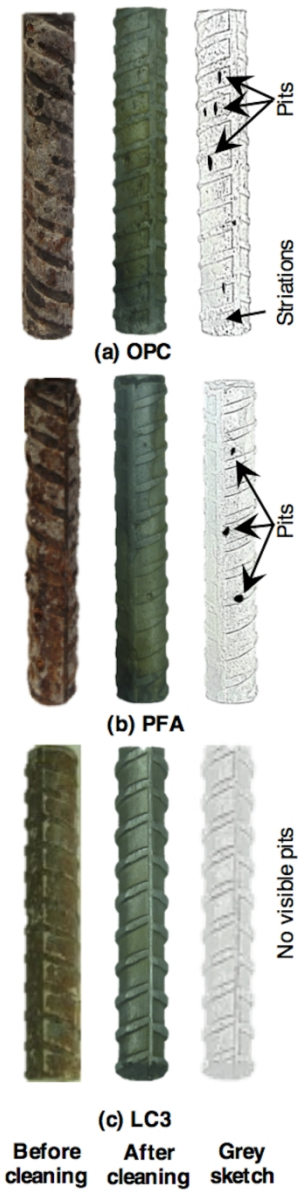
Steel surfaces of IC test specimens showing form and degree of corrosion
